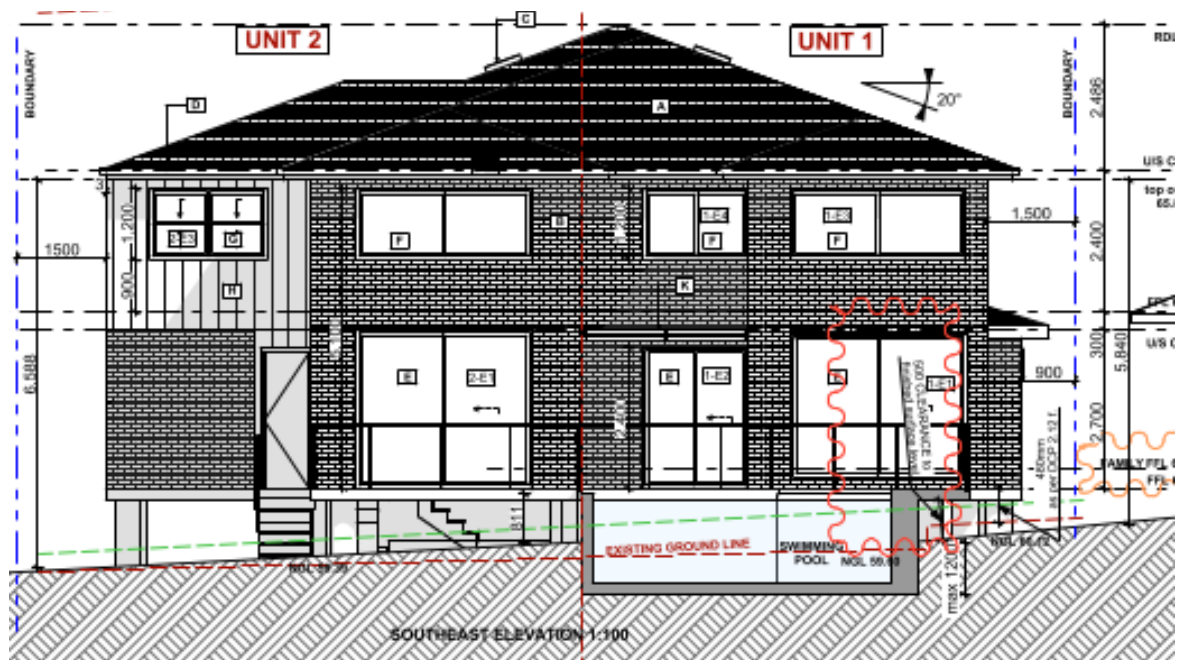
Amended design with the windows over the 1st floor area reduced in size. The windows will still provide sunlight to the ground floor family room but is now less dominant.
